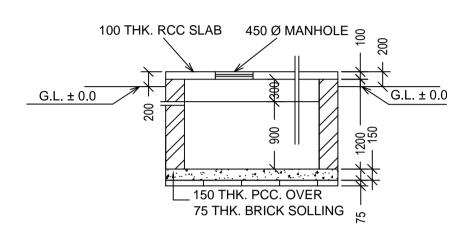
DETAIL OF SEPTIC TANK 25 USERS (SCALE: 1:50)
